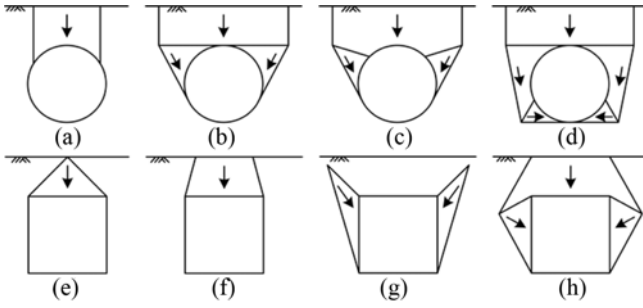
The Collapse Mechanisms for Tunnels. Four Collapse Mechanisms for a Circular Tunnel (Davis et al., 1980): (a) Roof Collapse, (b) Roof-Sides Collapse, (c) Combination of Roof and Roof-Sides Collapse, (d) Roof, Side Walls and bottom Collapse. Four Collapse Mechanisms for a Square Tunnel (Lyamin et al., 2001): (e) Local Roof Collapse, (f) Global Roof Collapse, (g) Local Wall Collapse, (h) Local or Global Roof and Wall Collapse
